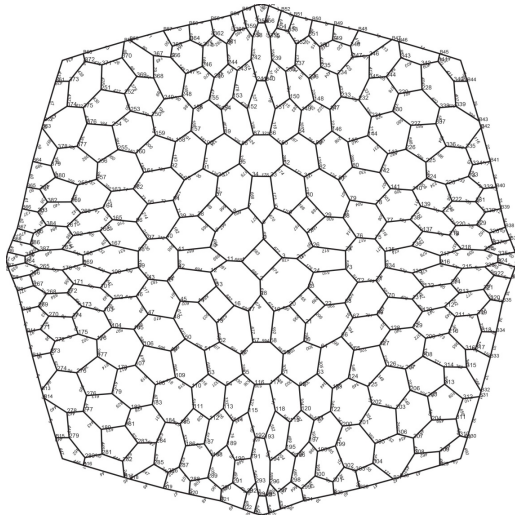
Plan view with the unique numbering of beams and joints used during the construction phase.
